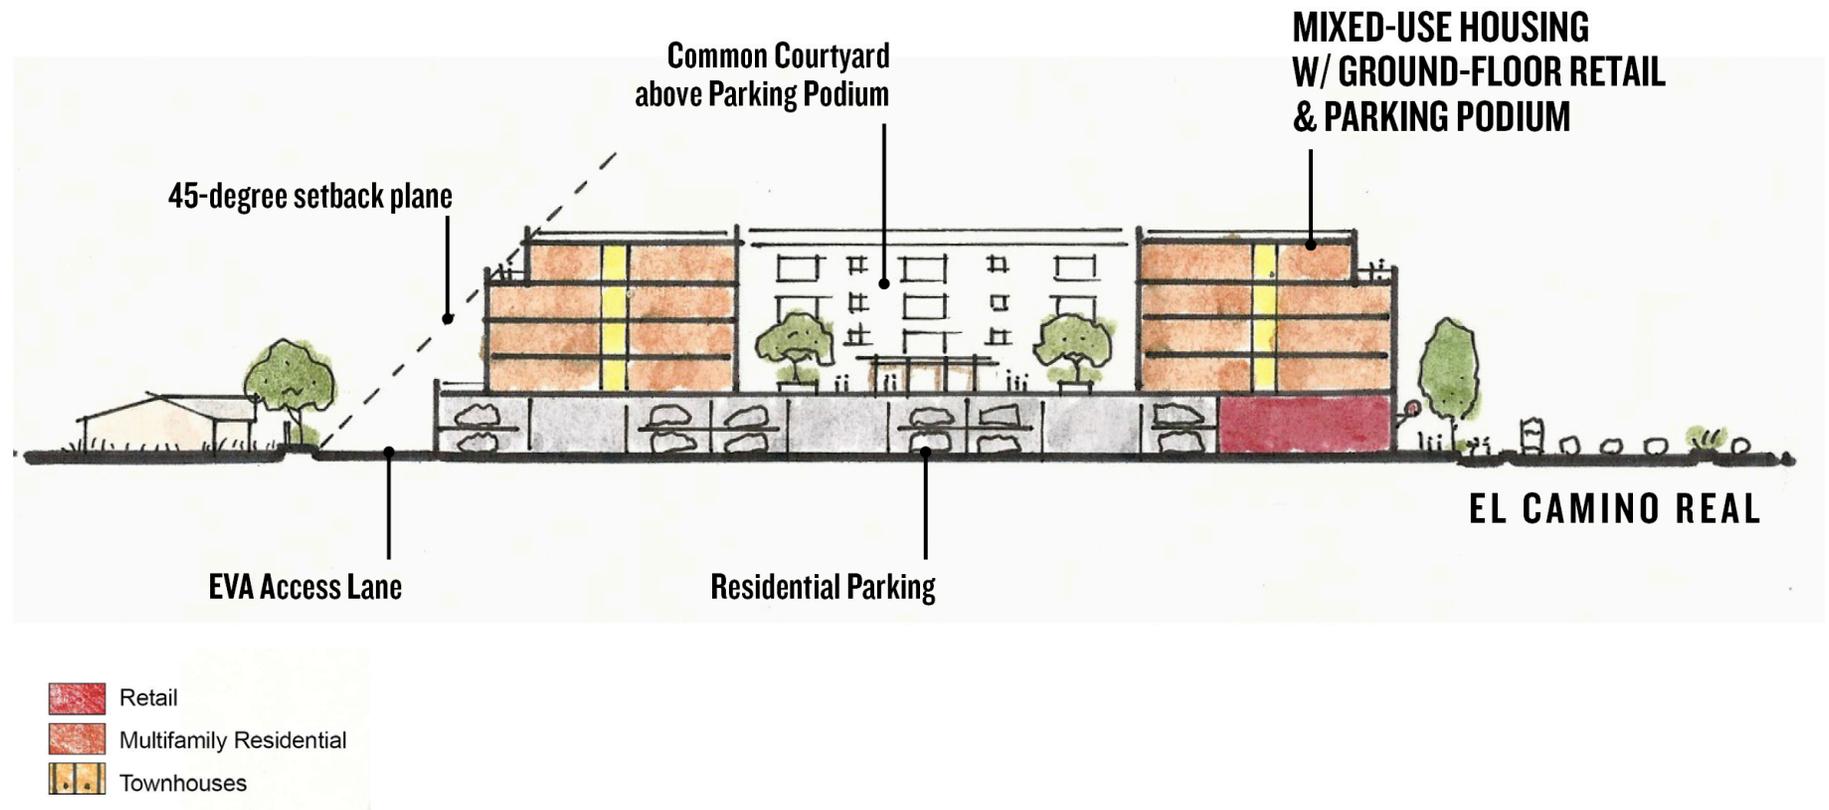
Corridor Mixed Use Conceptual Site Plan 2
